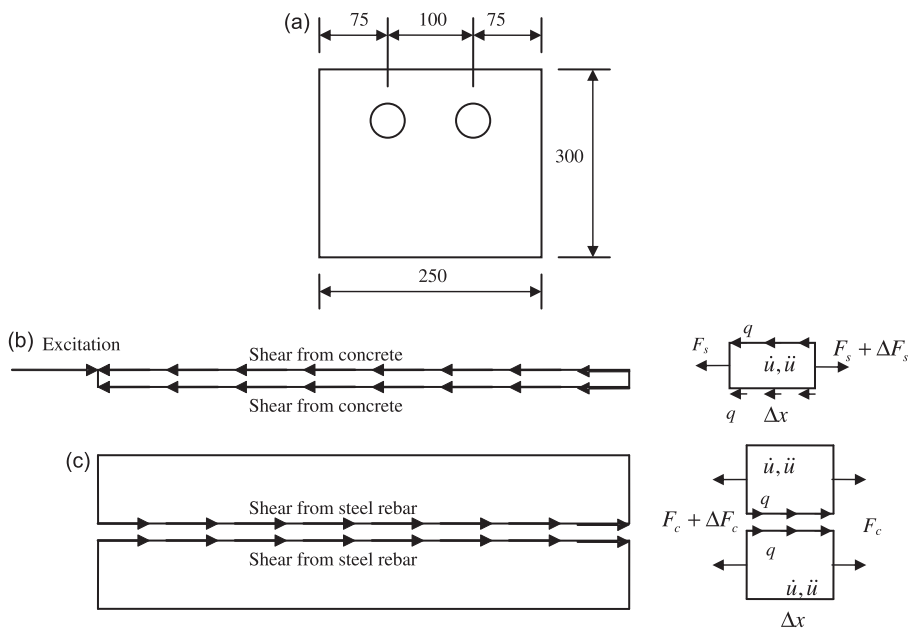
Concrete–steel interface spectral element: (a) cross section of concrete beam; (b) force on steel rebar; (c) force on concrete based on axial deformation assumption.
